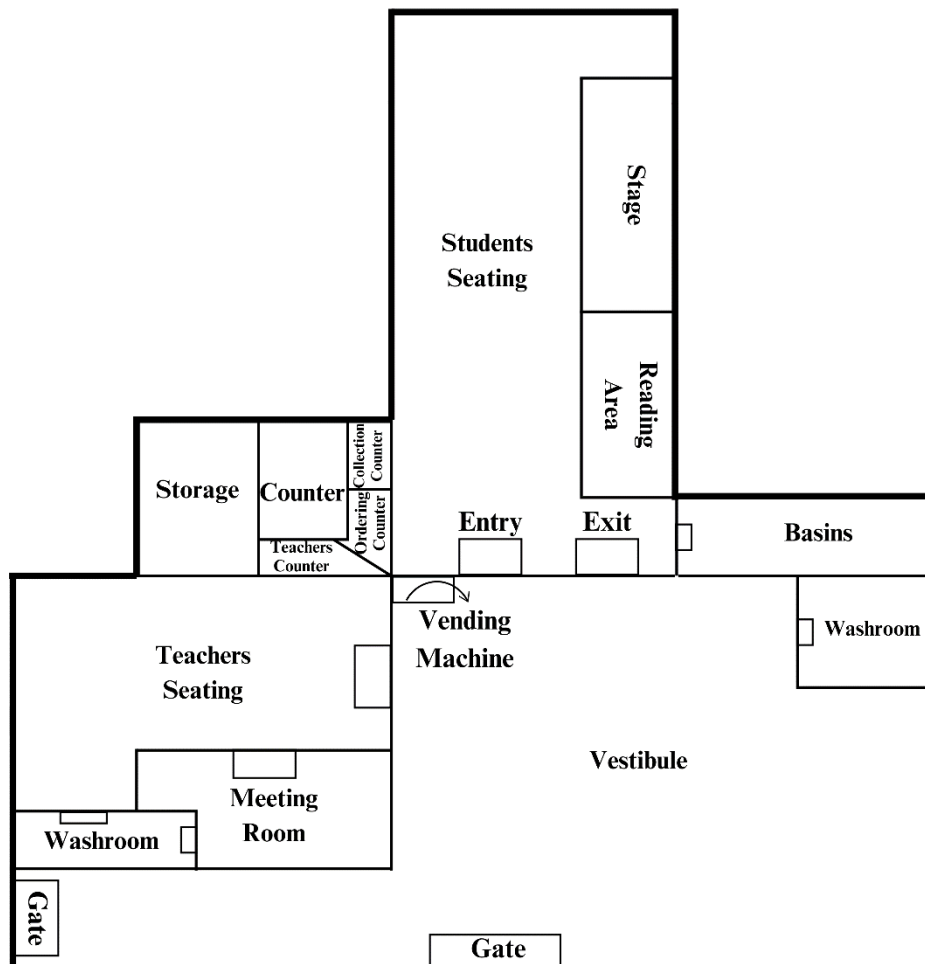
Layout after implementing ALDEP considering customer requirements.
